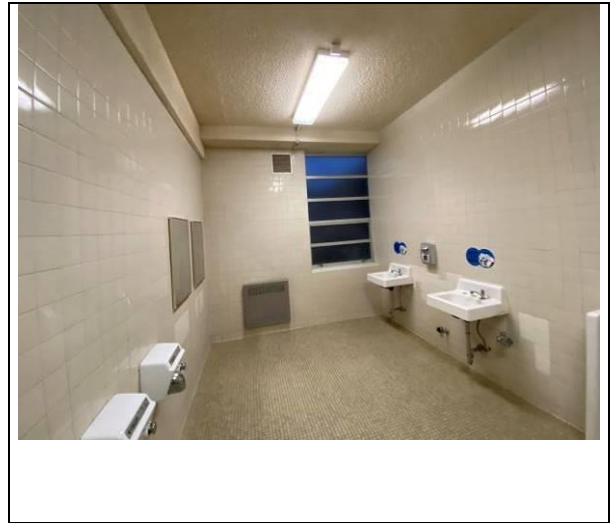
View of assumed ACBM white (4"X4") subway wall tile and (1"X1") tan ceramic floor tile observed in restrooms.
